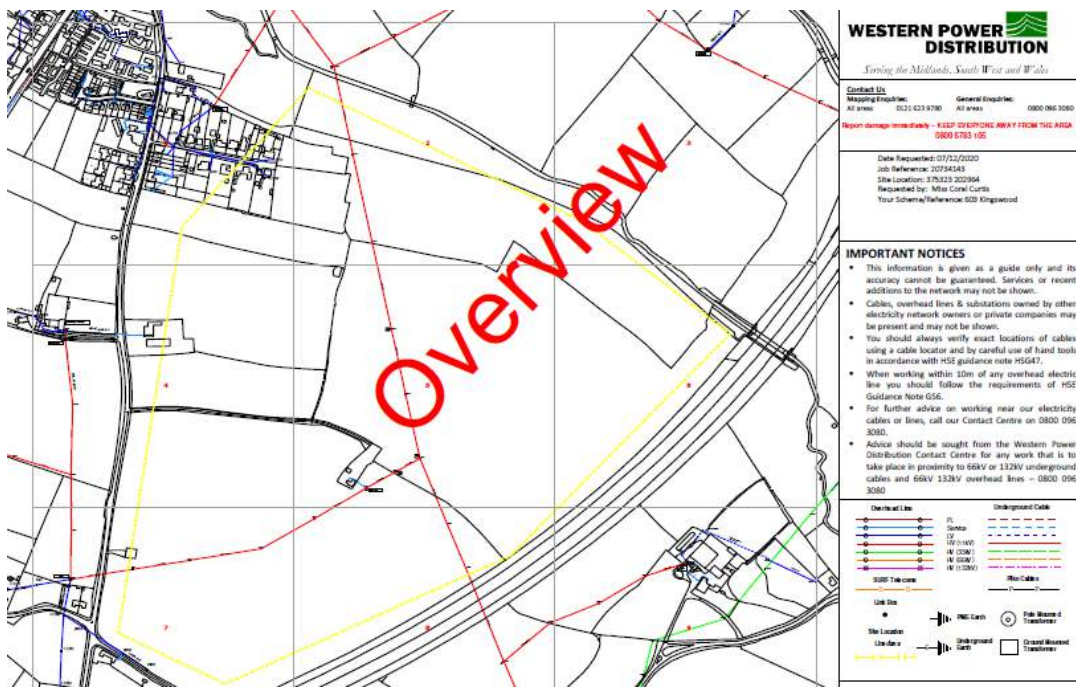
Extract of WPD showing overhead lines / underground cables owned by WPD (red line)
